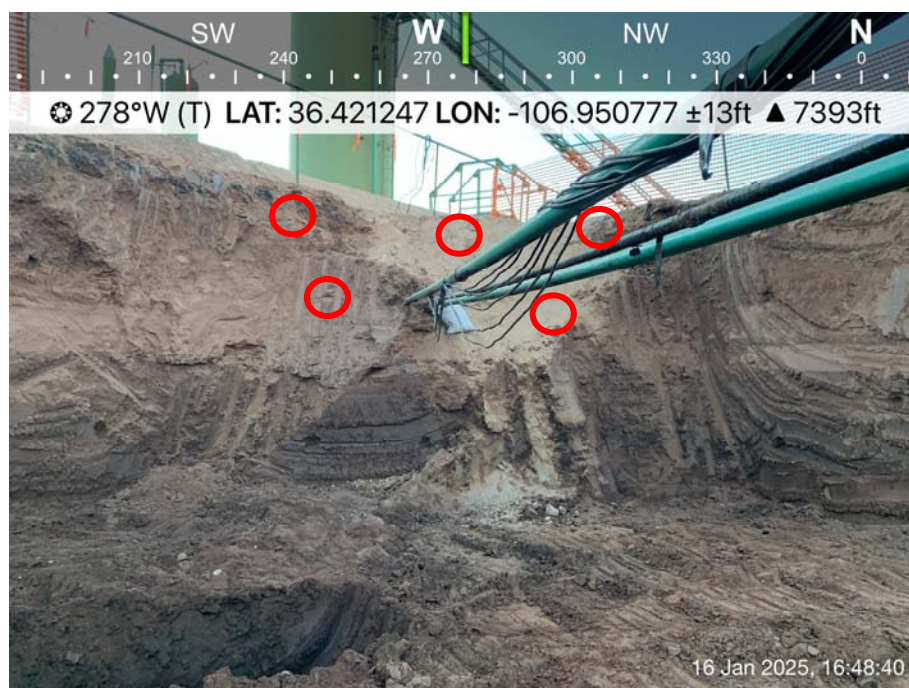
SS09 collected as a five-point composite sample 0-4 ft bgs from west sidewall of excavation.
